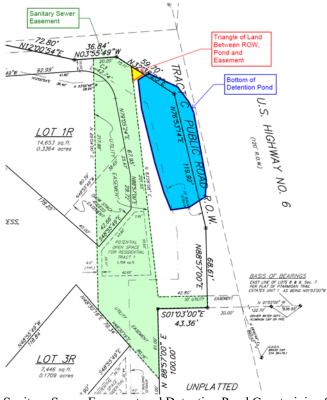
Sanitary Sewer Easement and Detention Pond Constraining Sign Location
